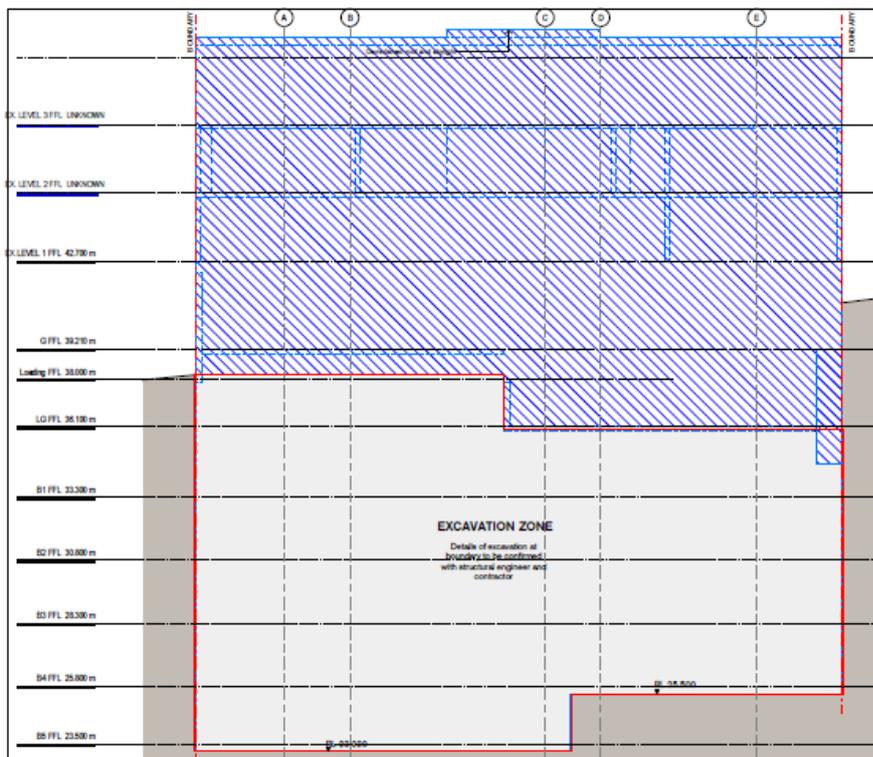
A north-south section plan, illustrating the area of the building to be demolished (in blue) and the extent of excavation below
